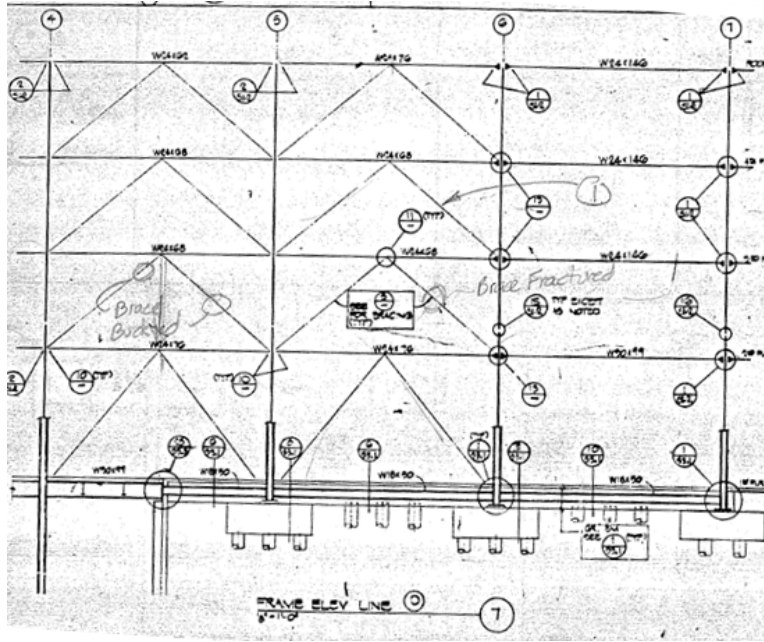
Frame Elevation (86CA4A--D-45-2)
